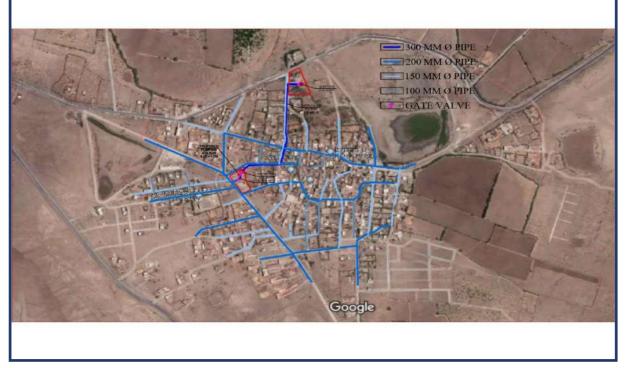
Proposed schematic layout plan of watersupply distribution system.
